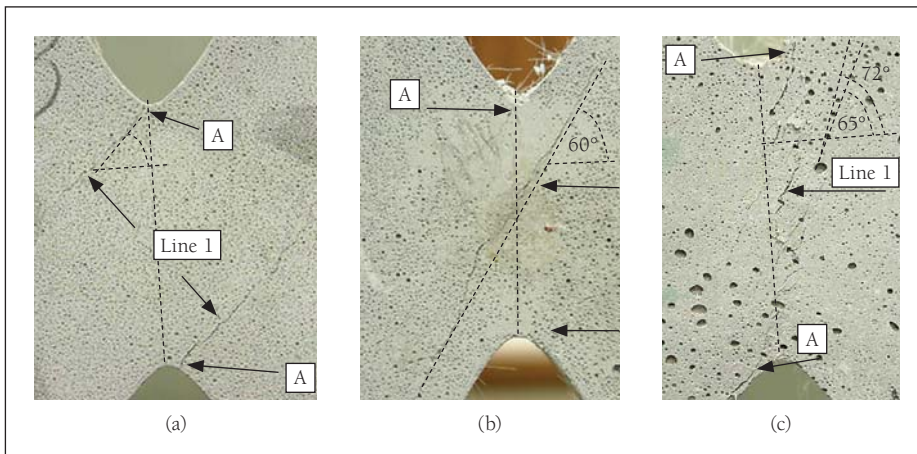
Typical failure crack patterns in (a) S1, (b) S2 and (c) S3 and S4 specimens
